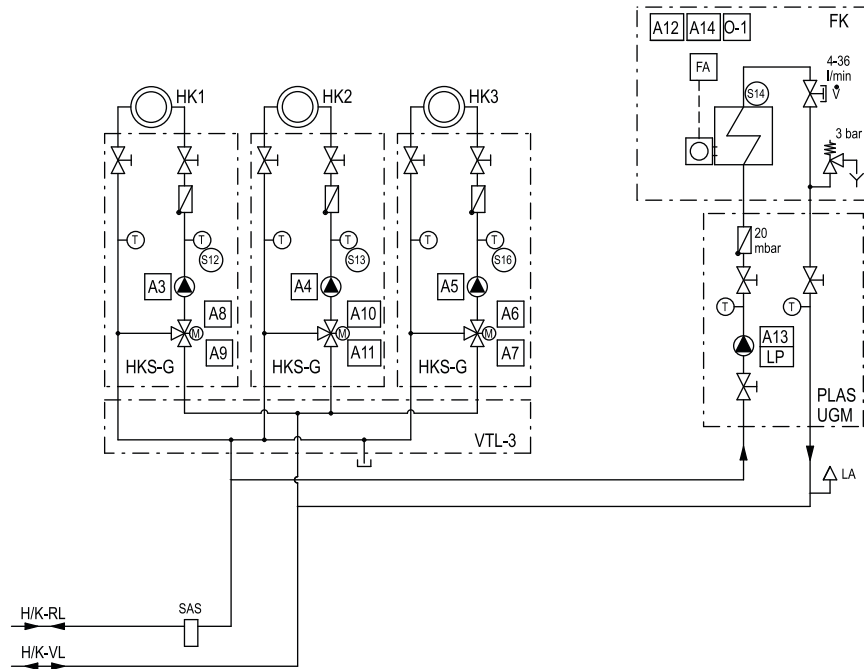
SolvisBen Solo with three mixed heating circuits, solar system and external boiler – part 2
